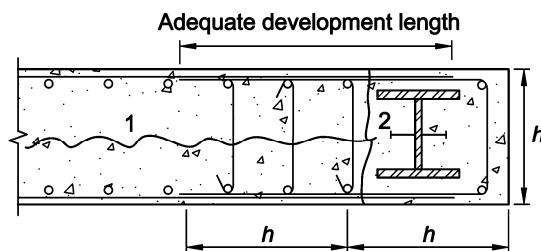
Reinforcement to prevent splitting failures.
